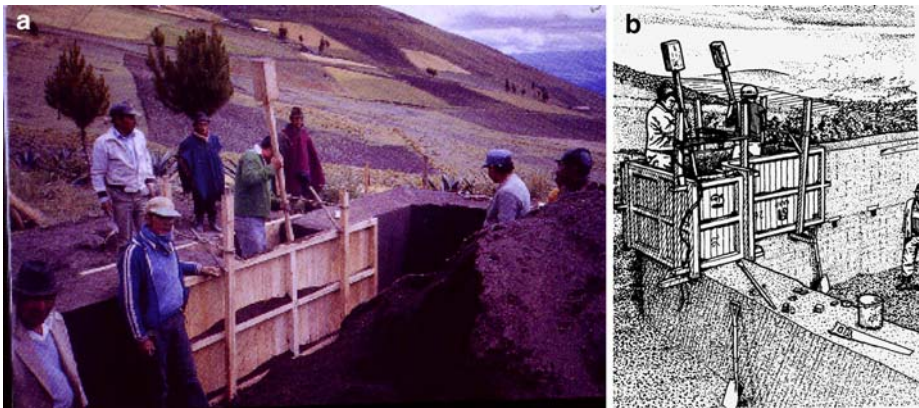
Builder education in the Ecuadorian Andes, in rebuilding after the earthquake of March 1987 (a). Reconstruction used traditional rammed earth wall construction but with an improved mould which helped to eliminate a critical weakness at the corners (b) (Photo and drawing courtesy of Eric Dudley)
